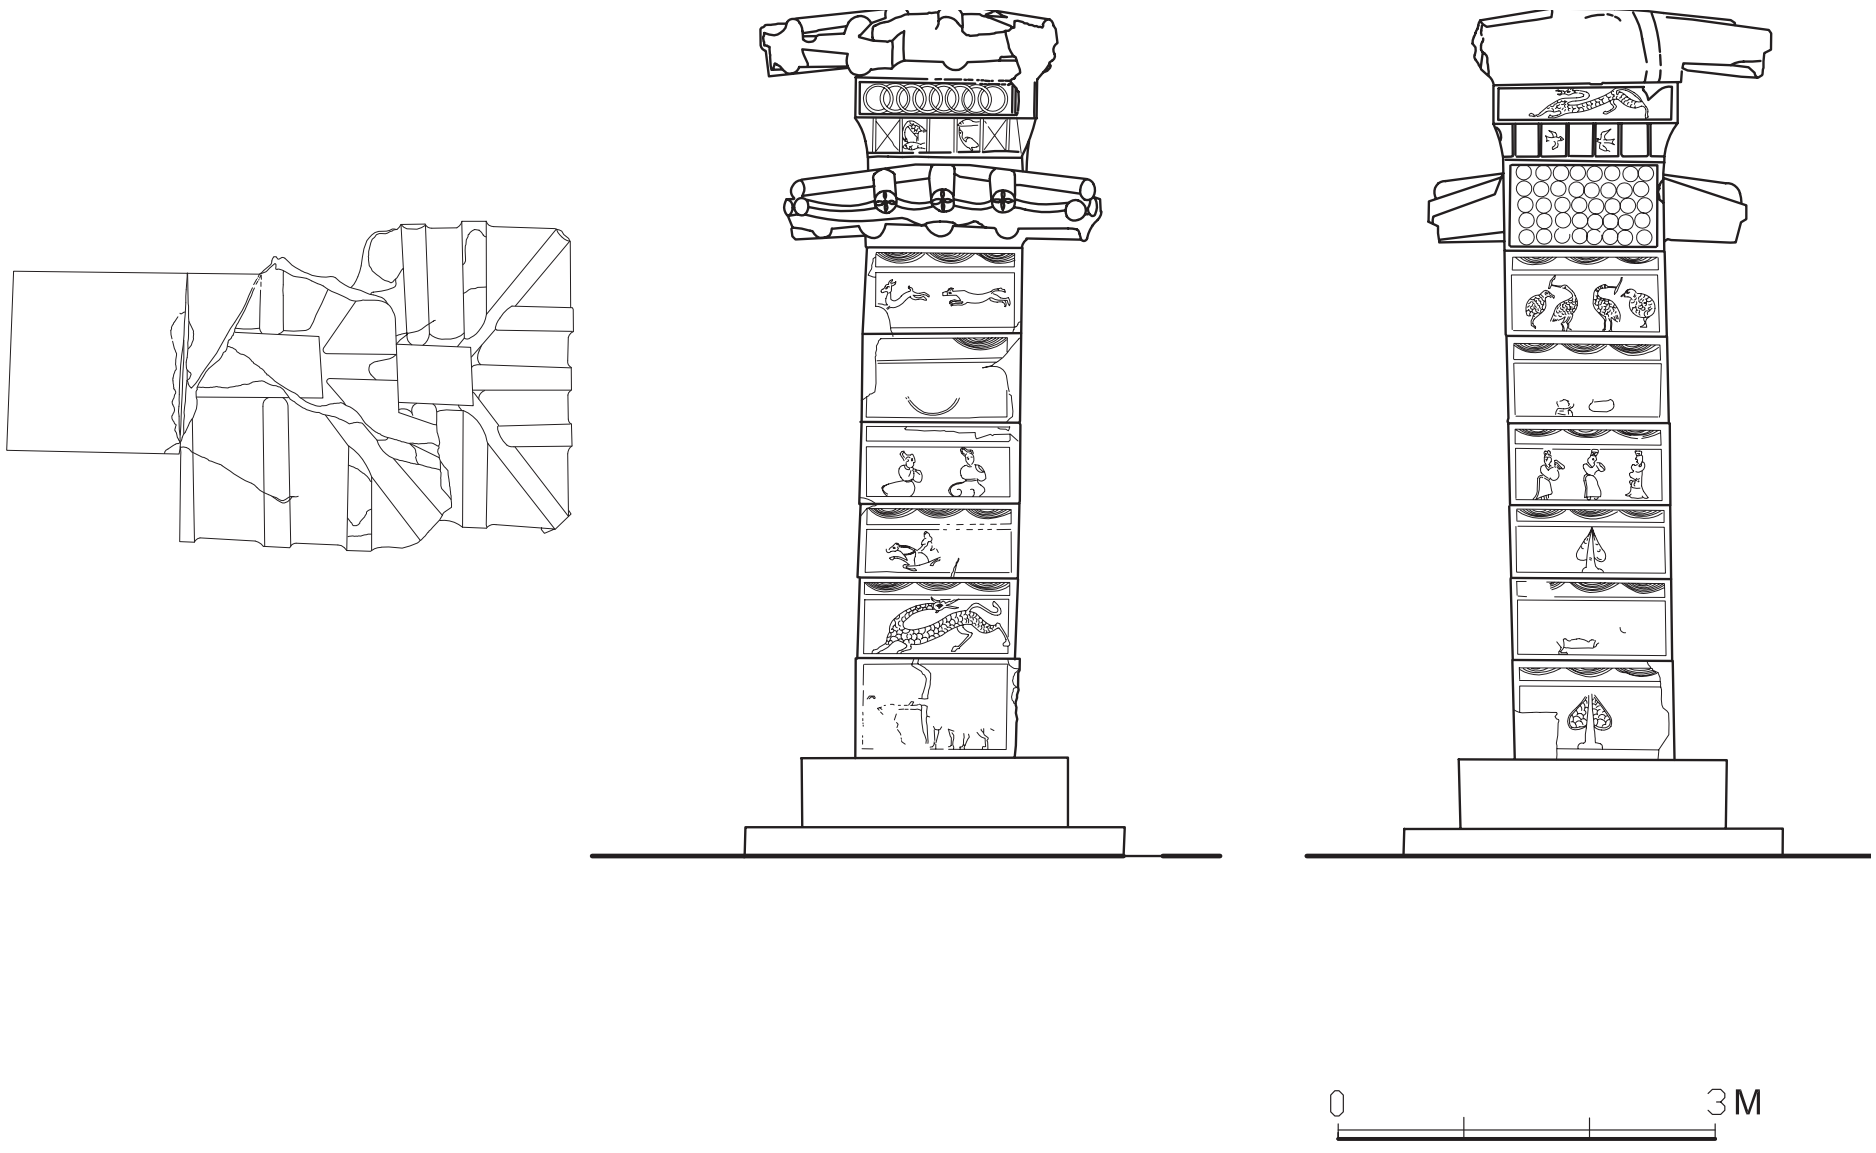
North and south elevation of East Structure of Shaoshi Que Gates
